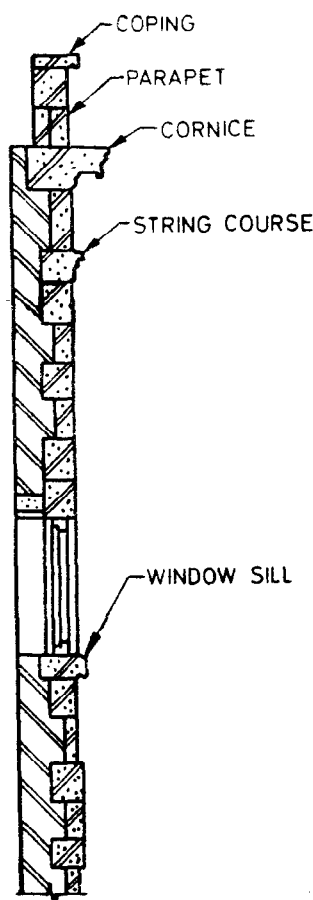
SECTION OF ASHLAR WITH BRICK MASONRY
